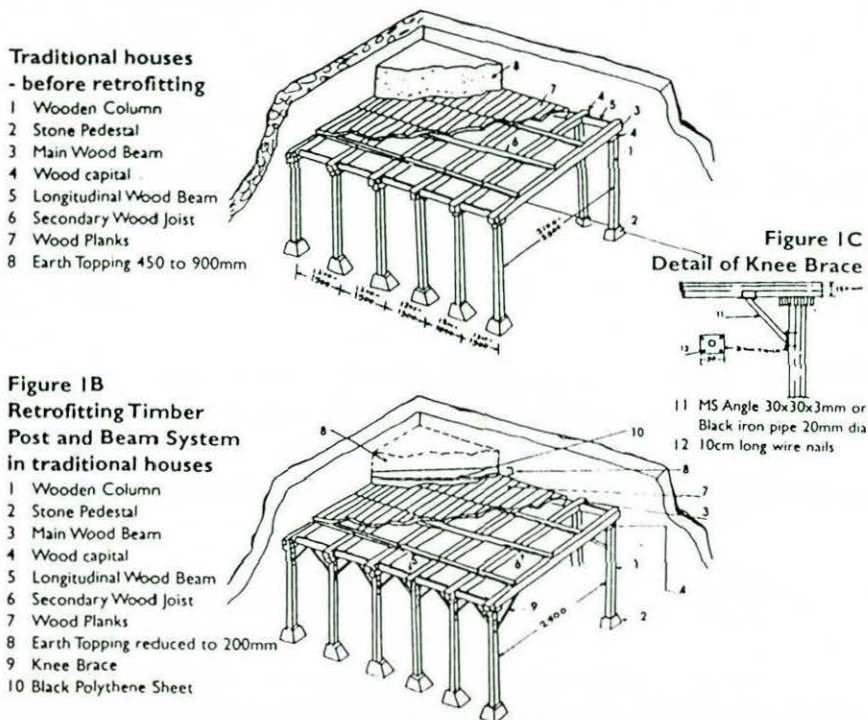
Retrofitting of traditional buildings supported on wooden frames
